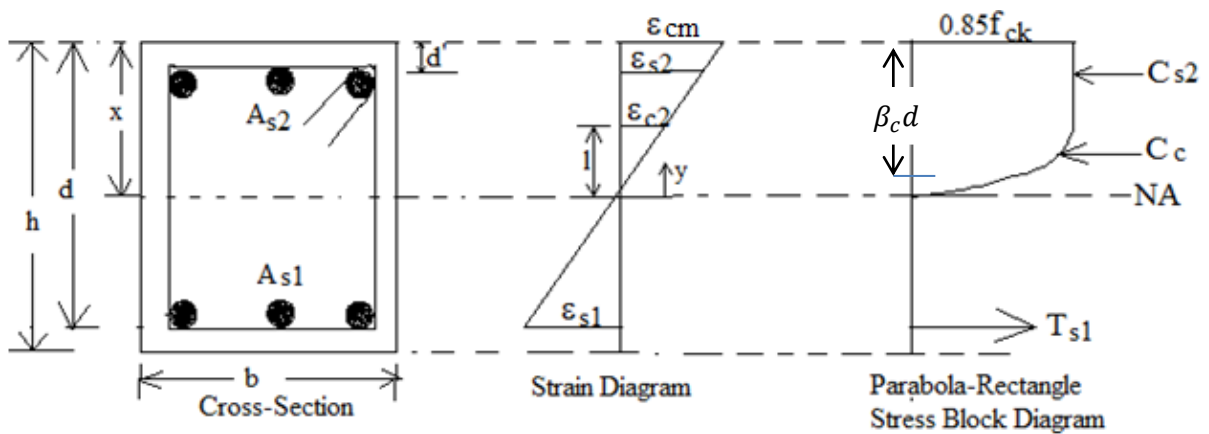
Strain and Stress Distribution over a Reinforced Rectangular Concrete Section
